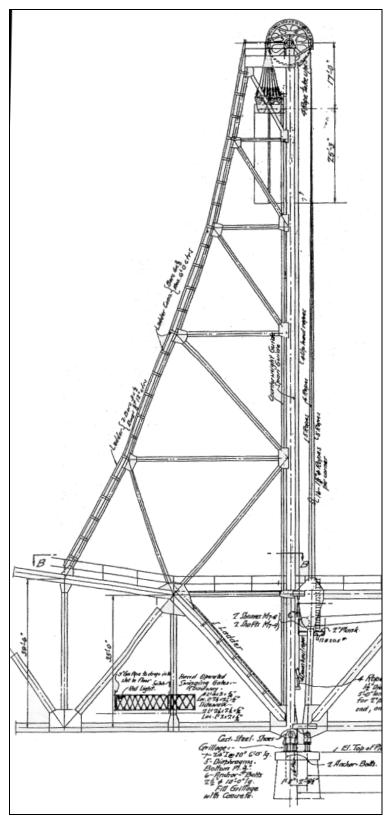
Tower, typical (NHDOT) [Full plan at Figure O-11]
